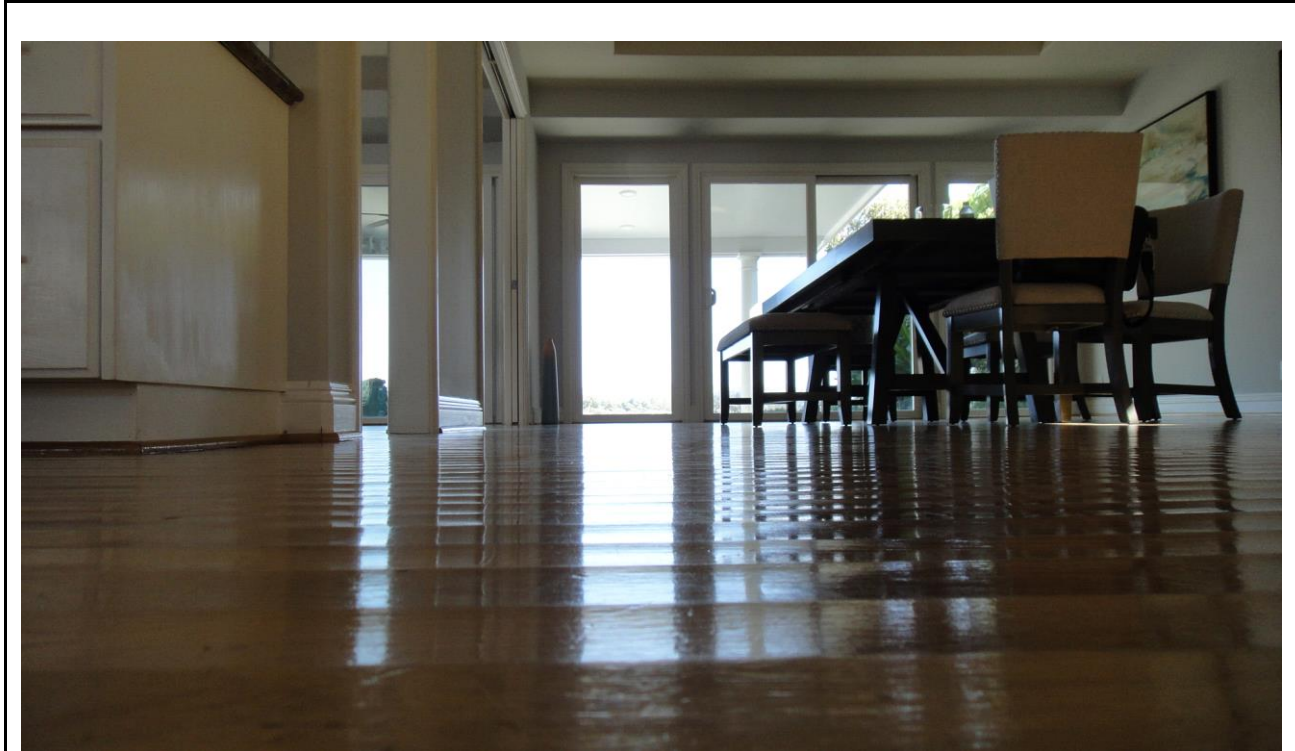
A close-up view of the floor cupping in the kitchen/dining room.
